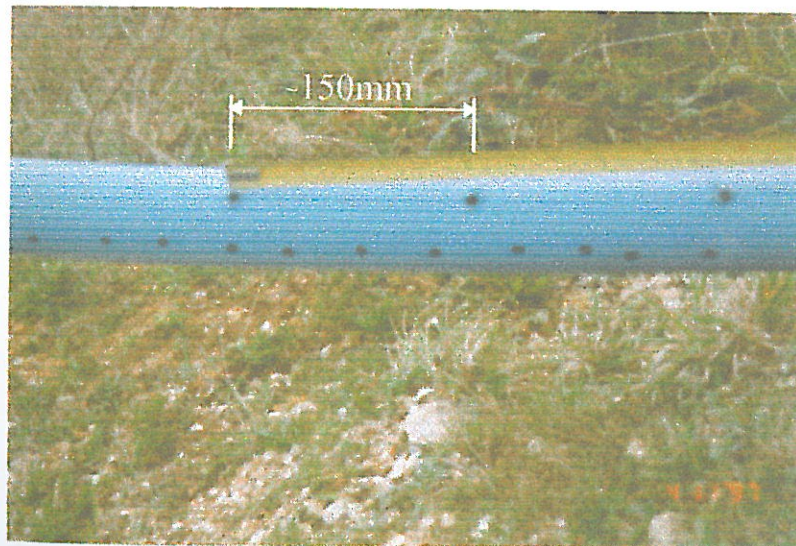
Typical section of hand drilled perforated MDPE Mole Drainage pipe.
